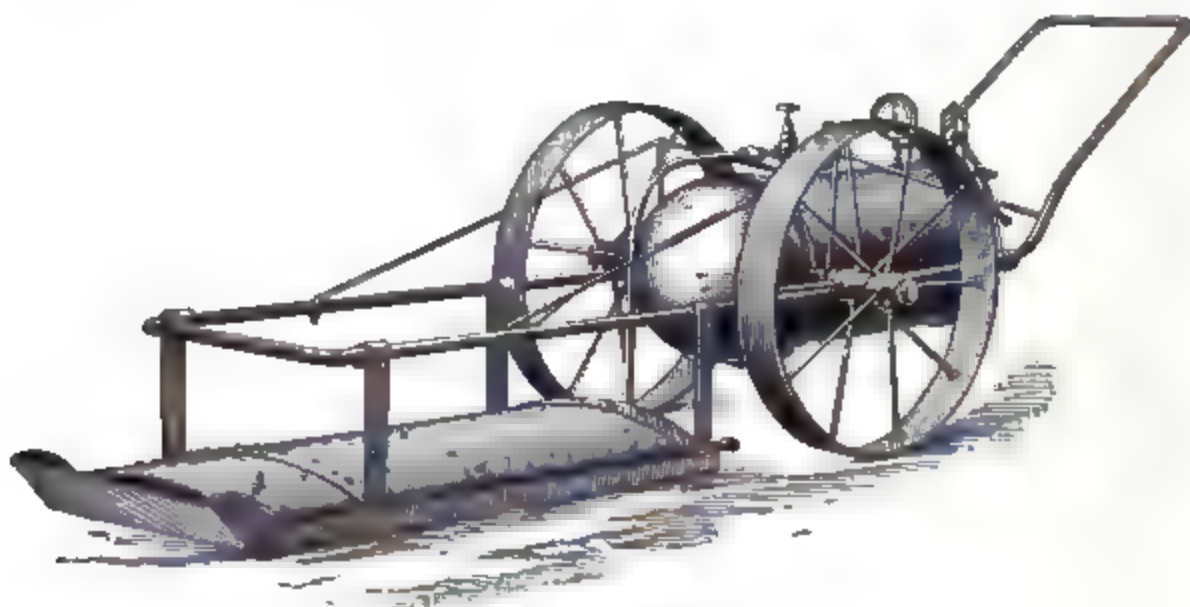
SURFACE HEATER FOR REPAIRING ASPHALT PAVEMENTS.
